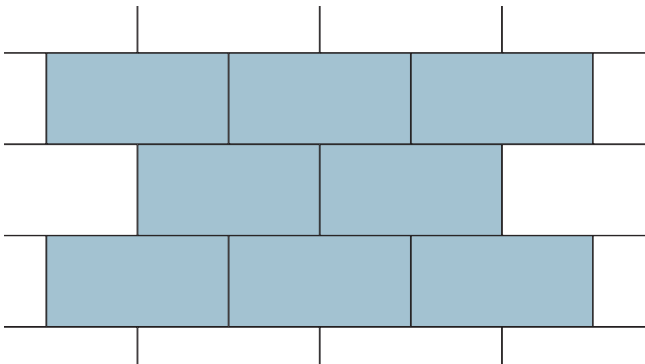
Typical Top Hat Set-out – 1200mm Width Vertical Panels with 10mm Joints shown
